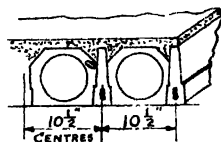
“ ARMO-CRETE ” FLOOR CONSTRUCTION
